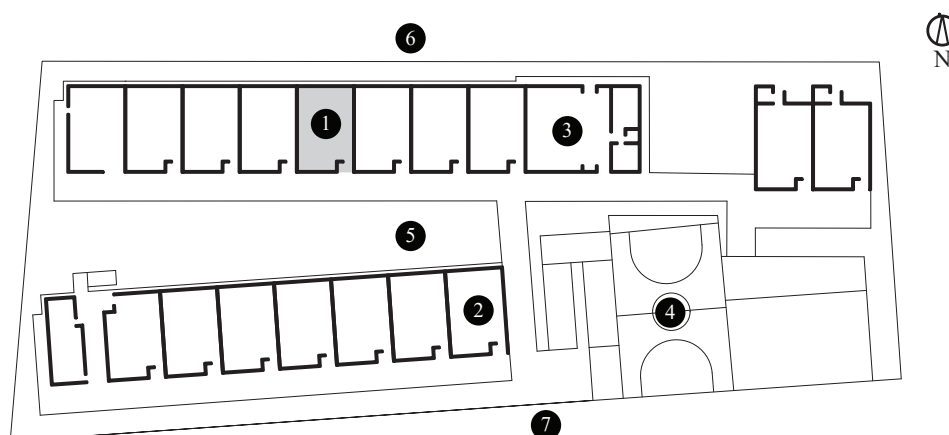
The school. Floor plan (1) Classroom 1, (2) Principal's and teacher's office, (3) Dining hall, (4) Roofed basketball courtyard, (5) Courtyard, (6) Football field, (7) Main Street entrance.
